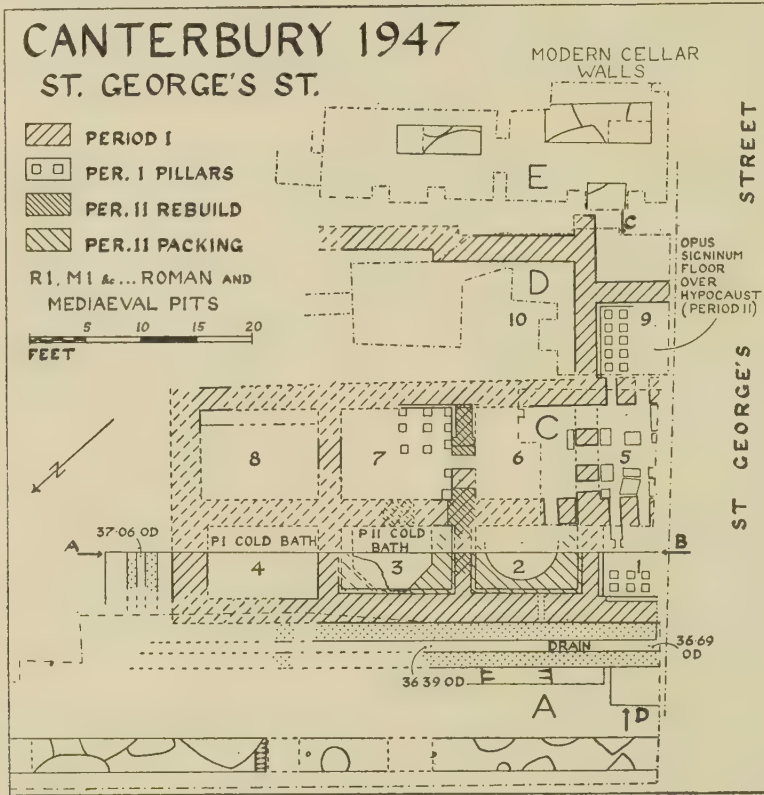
PLAN OF BATH HOUSE IN ST. GEORGE'S STREET, CANTERBURY
